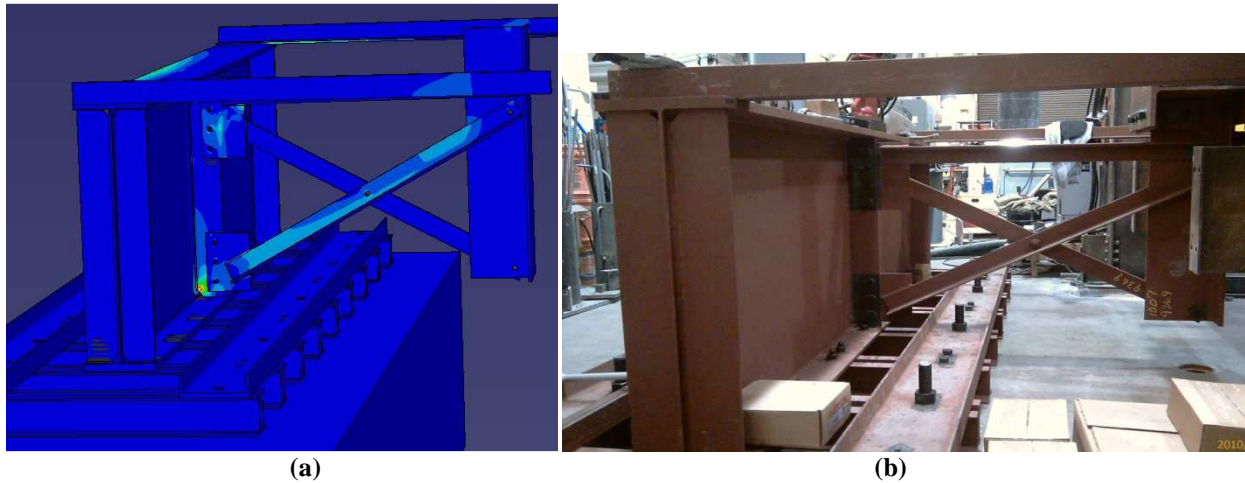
(a.) Detailed finite element model of the 2.7-m (9-ft) girder and (b.) the physical specimen tied to the laboratory floor.
